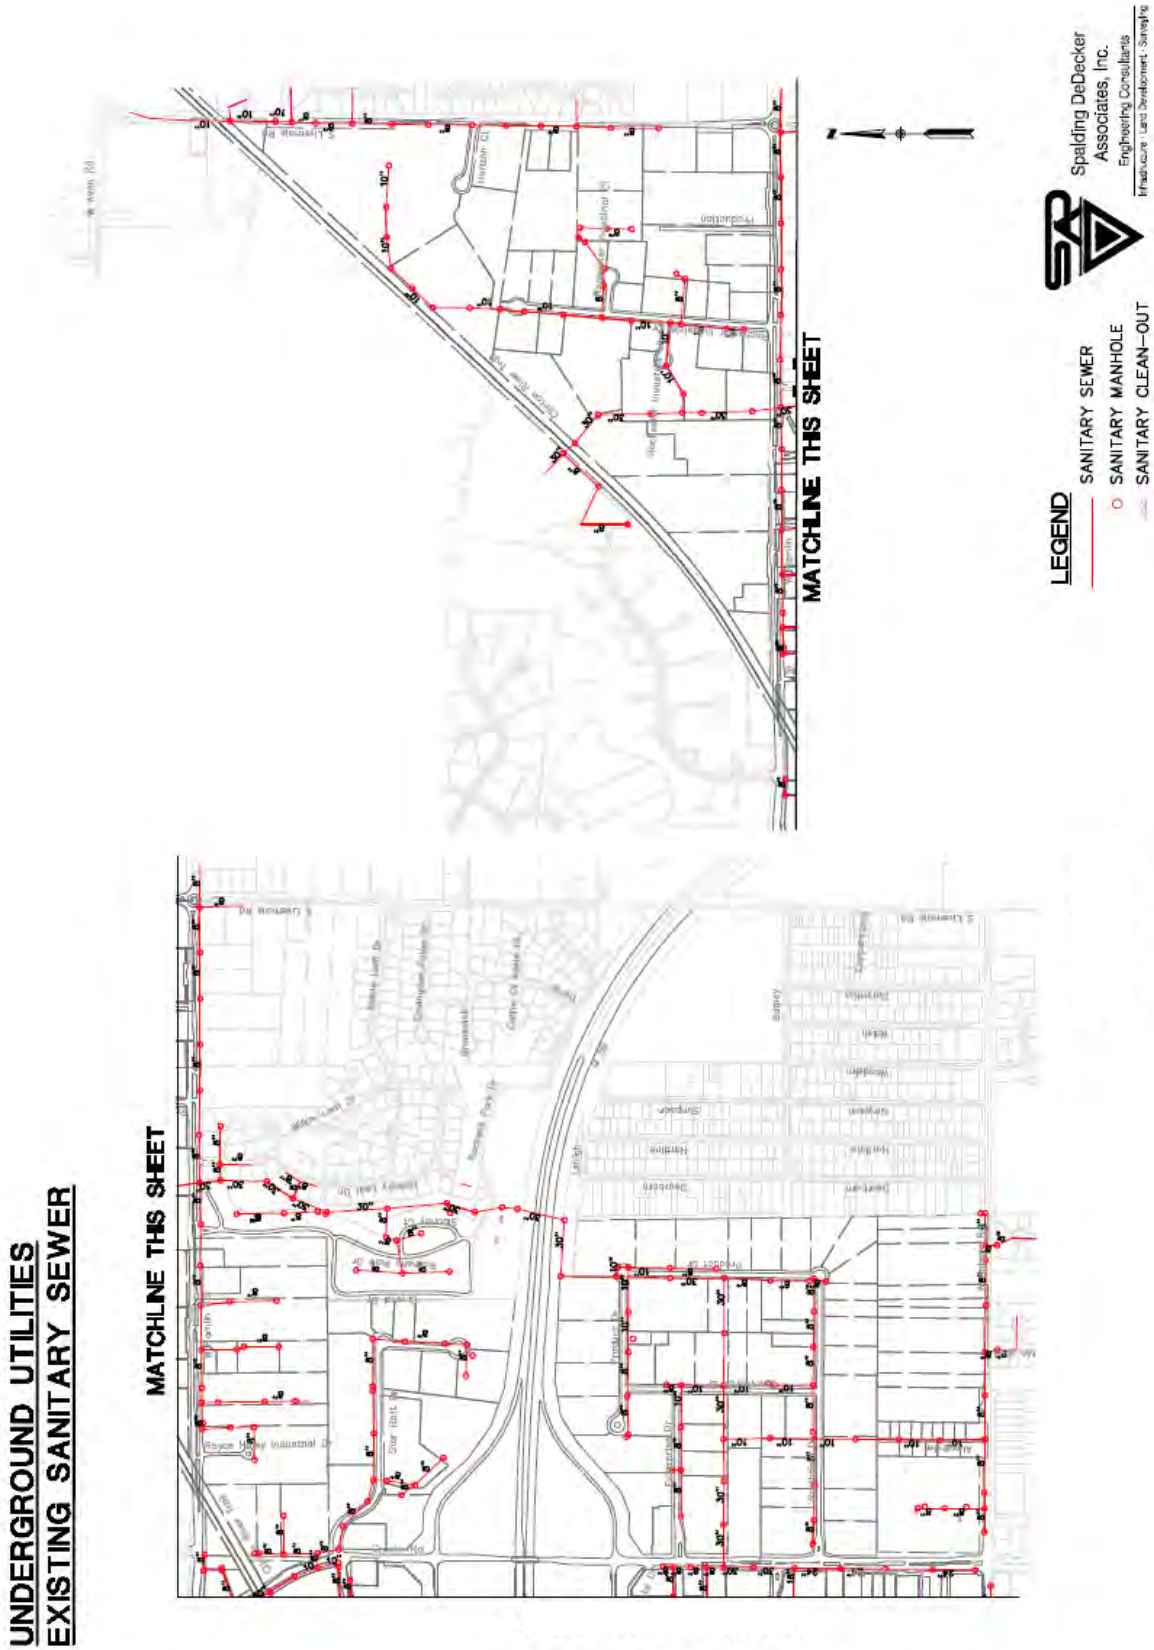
Underground Utilities – Existing Sanitary Sewer (west section)
